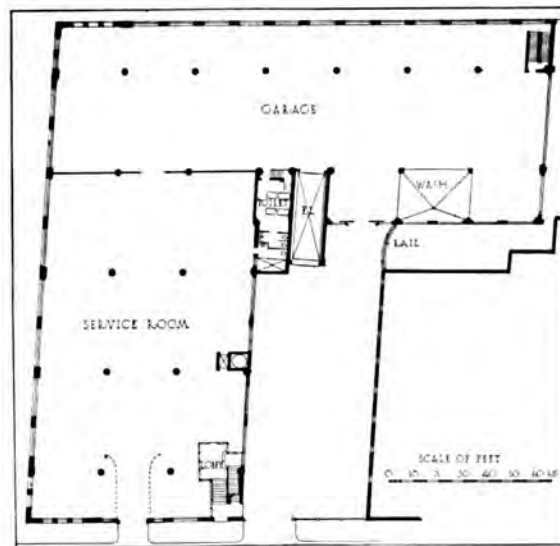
DETAIL OF PACKARD SERVICE BUILDING, DETROIT
